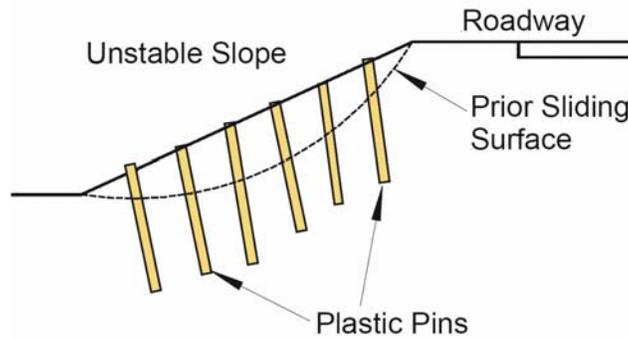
Profile of recycled plastic pins stabilizing a potential sliding surface (Loehr et al., 2000).
